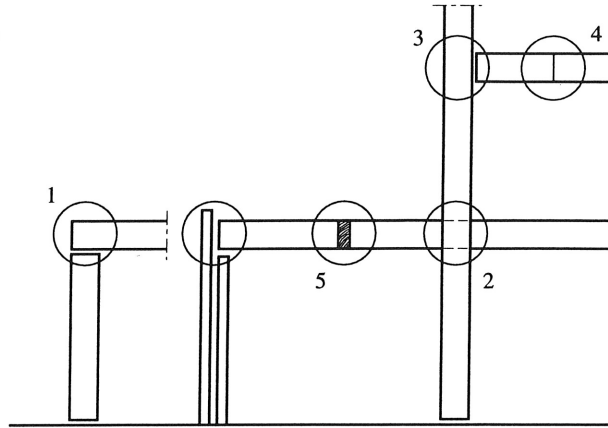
Main types of connection. (1) Corner connection, column to beam or frame corner, (2) connection between continuous beam and column, (3) column to beam connection in a multi-storey structure, (4) beam to beam connection: two beams in line, (5) beam to beam connection between a secondary beam and a main beam.
